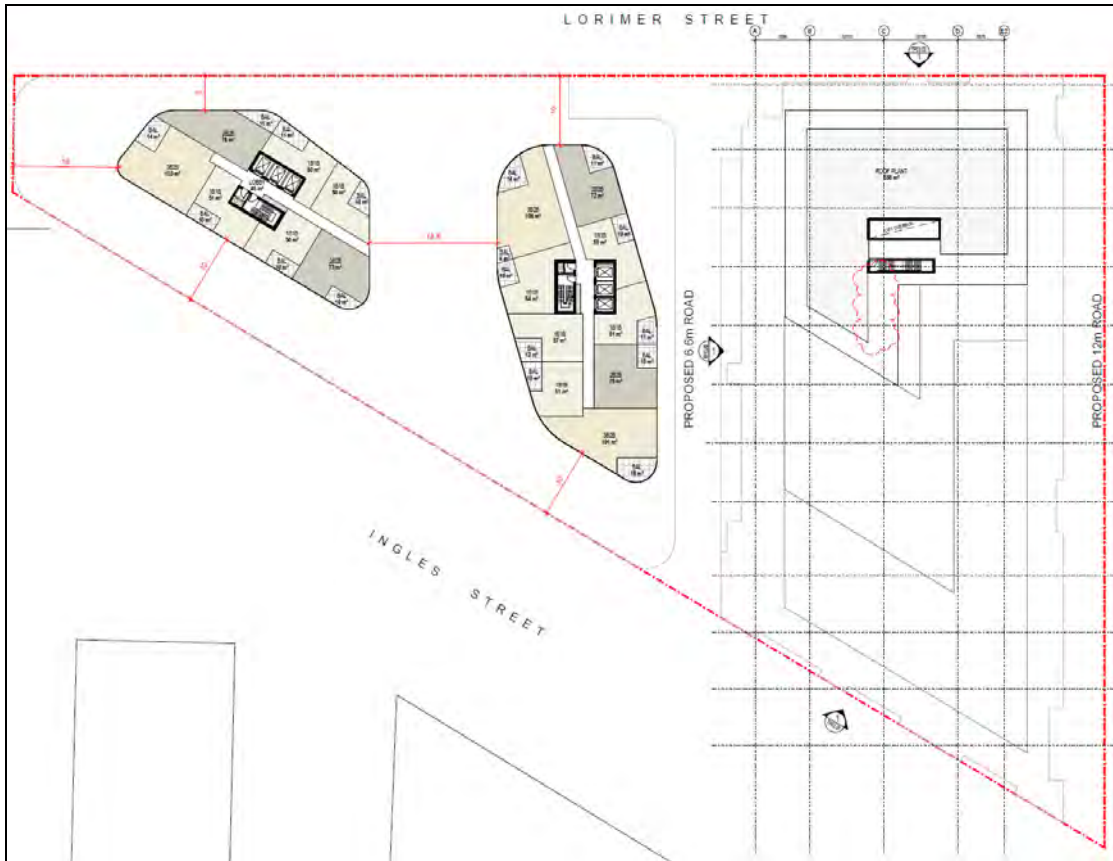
Tower siting and Levels 15-23 typical apartment layout (Stage 2)
